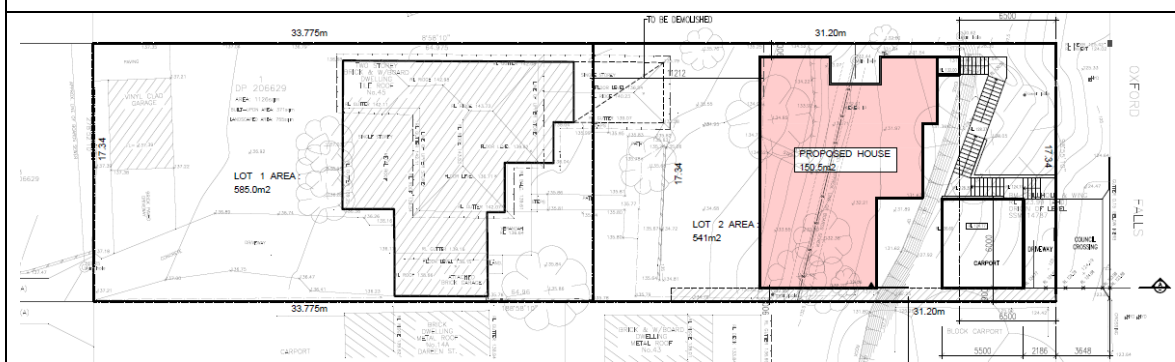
The above image is the proposed plan of the two newly created lots. The siting and dimensions of the proposed new dwelling [highlighted], the new access driveway and carport are detailed on this plan.
